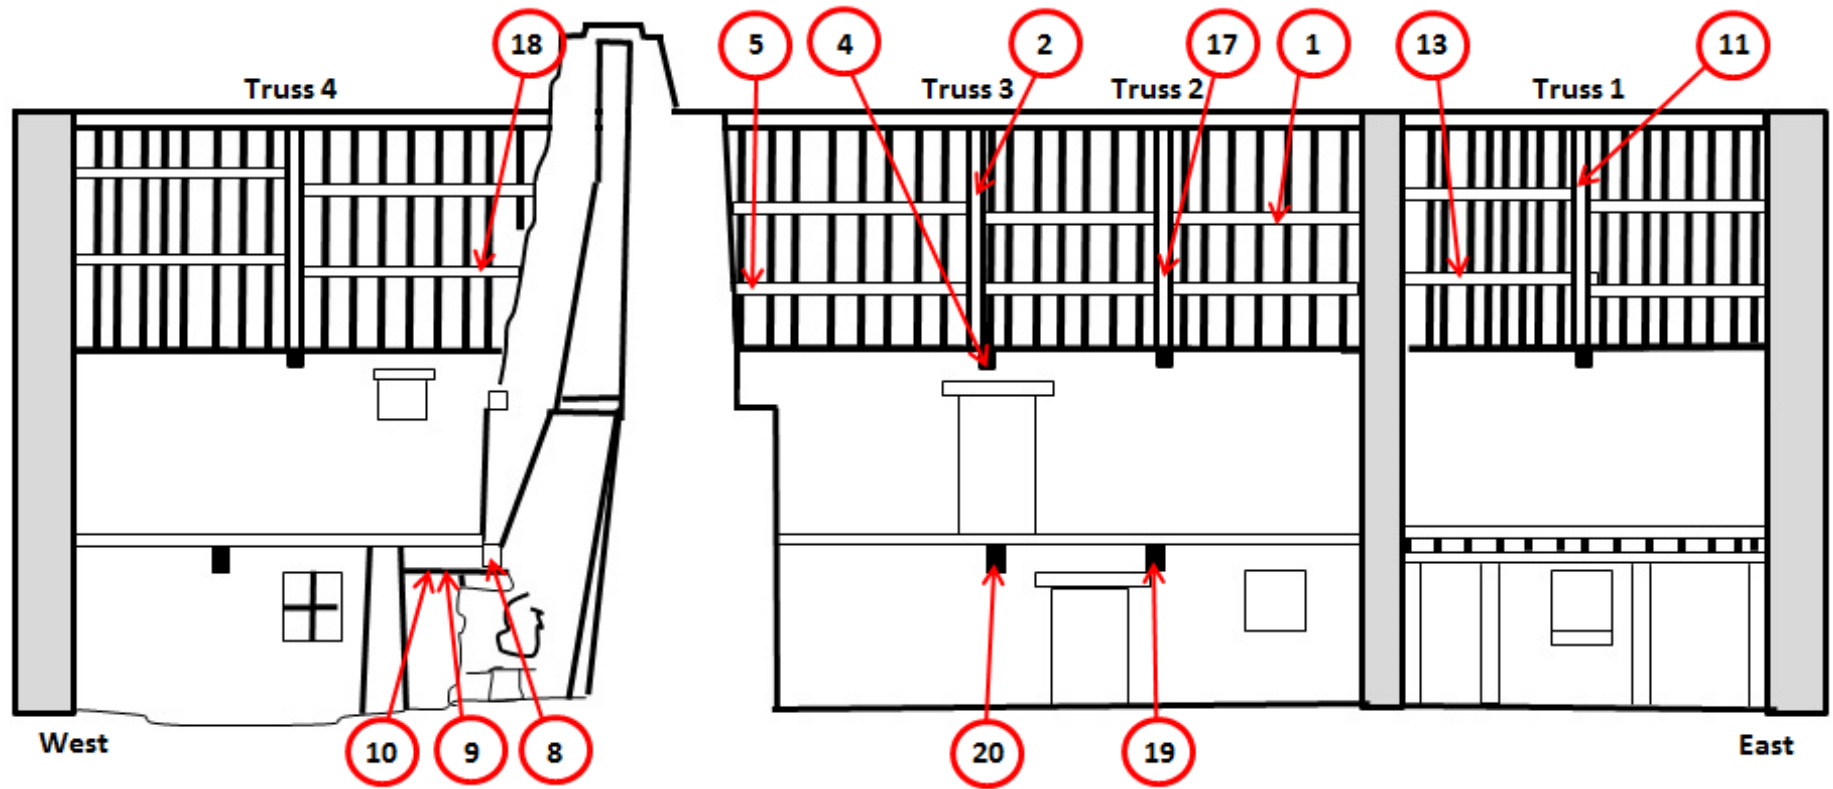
Long-section of the Former Farmhouse, viewed looking north, to locate sampled timbers (based on drawing in possession of the owners of unknown source)
